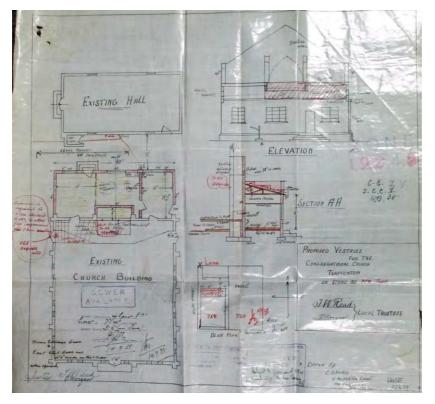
Alteration and Additions to Congregational Church (Source: City Council of Johannesburg, Plans Archive)
